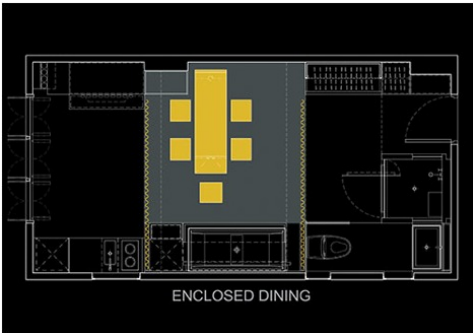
Wall – Sliding walls creates multiple rooms – Hong Kong Apartment 24 rooms in a 32 sq meter apartment
